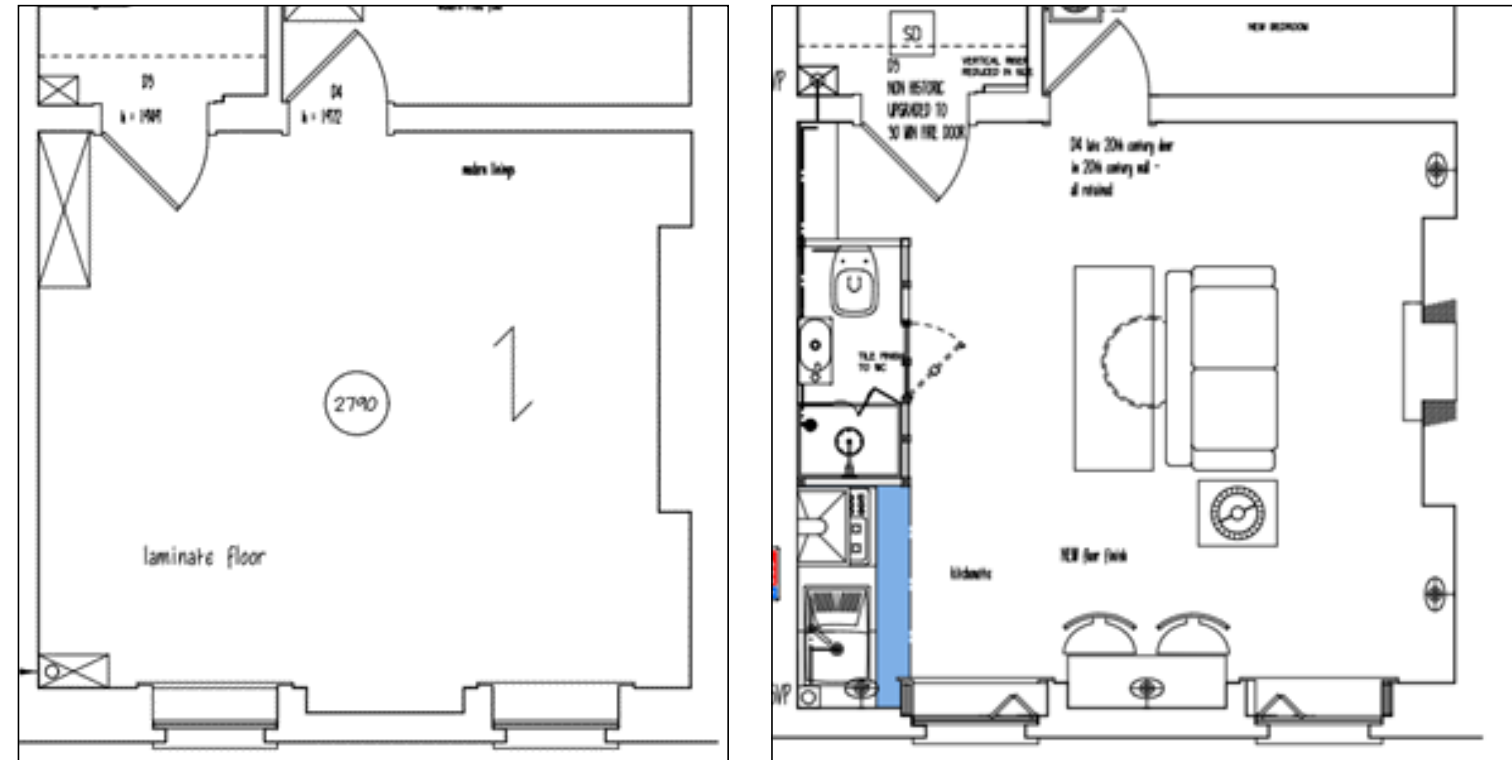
Existing (left) and Proposed (right) first floor layout plans for similar works at 49 Marchmont Street
